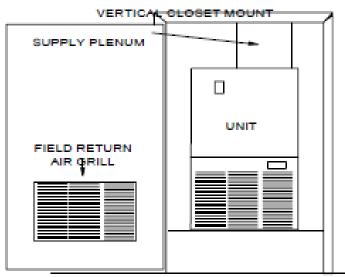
Typical Wall Mount Installation with Wall Panel Door
